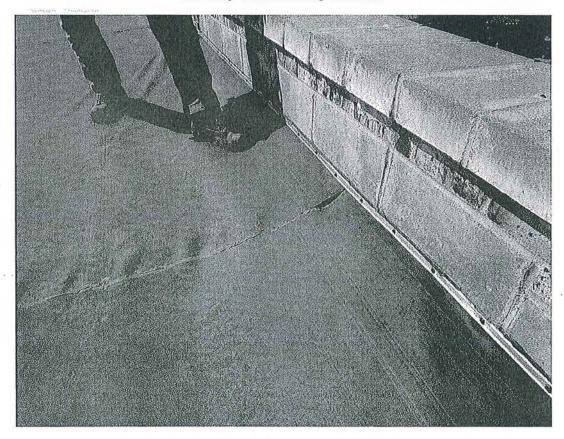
roof membrane hole where it appears the roof deck is below the membrane
